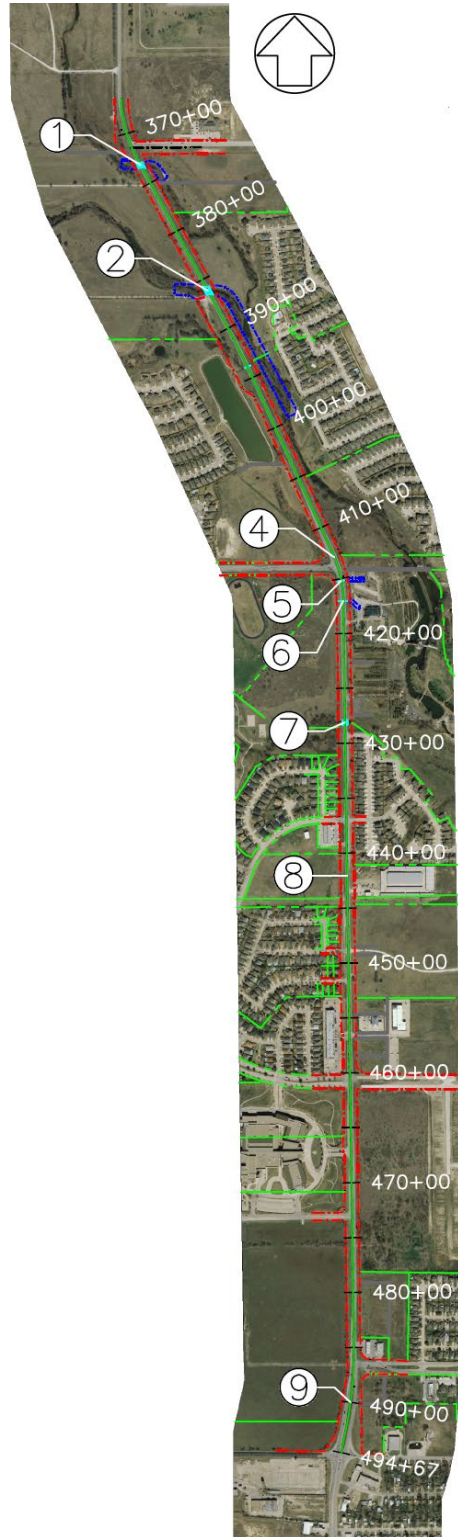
Layout of Existing Cross Drainage Structures (Not to Scale)
